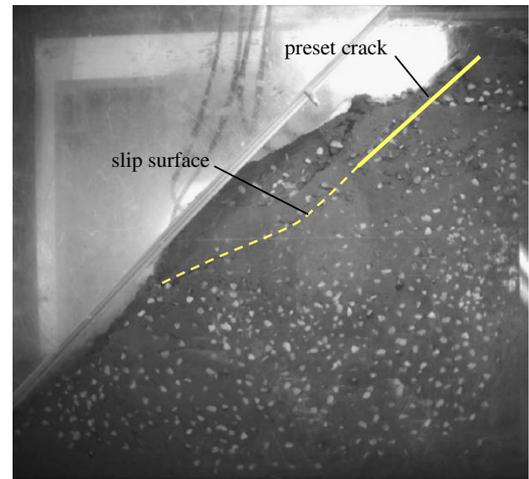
Final failure of the slope with an oblique crack (4# test).
